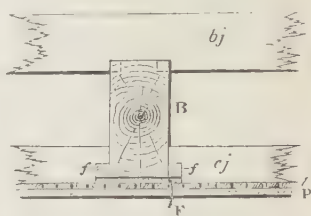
Ceiling Joists supported by Fillets fixed to Binder.
